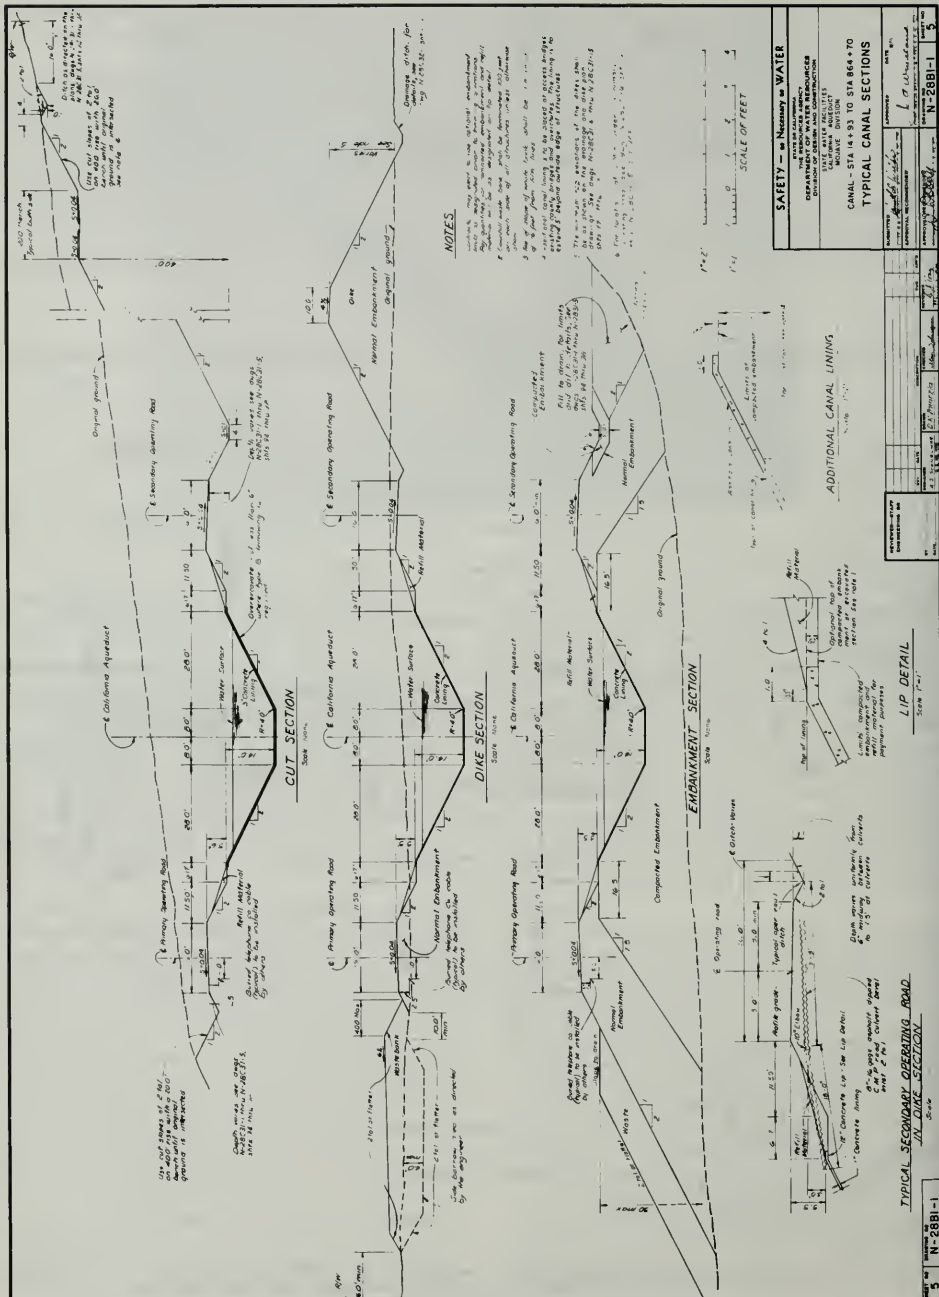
Typical Canal Sections—Pearlblossom Pumping Plant to Los Angeles-San Bernardino County Line
